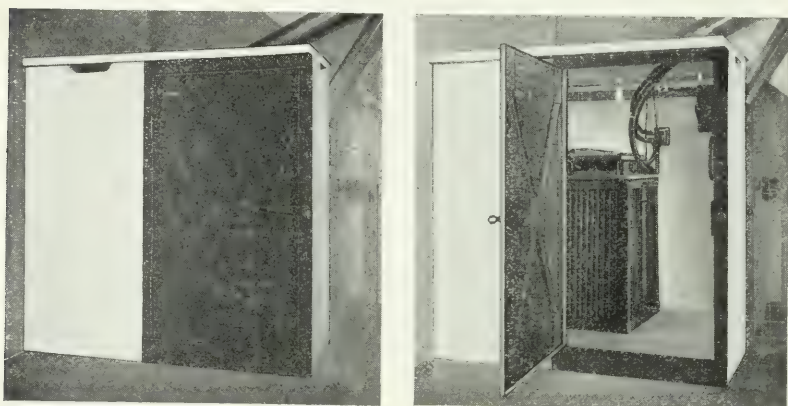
TRANSFORMER CELL IN BASEMENT OF DEPARTMENT STORE, CONSTRUCTED WITH STANDARD REINFORCED CEMENT SLABS
